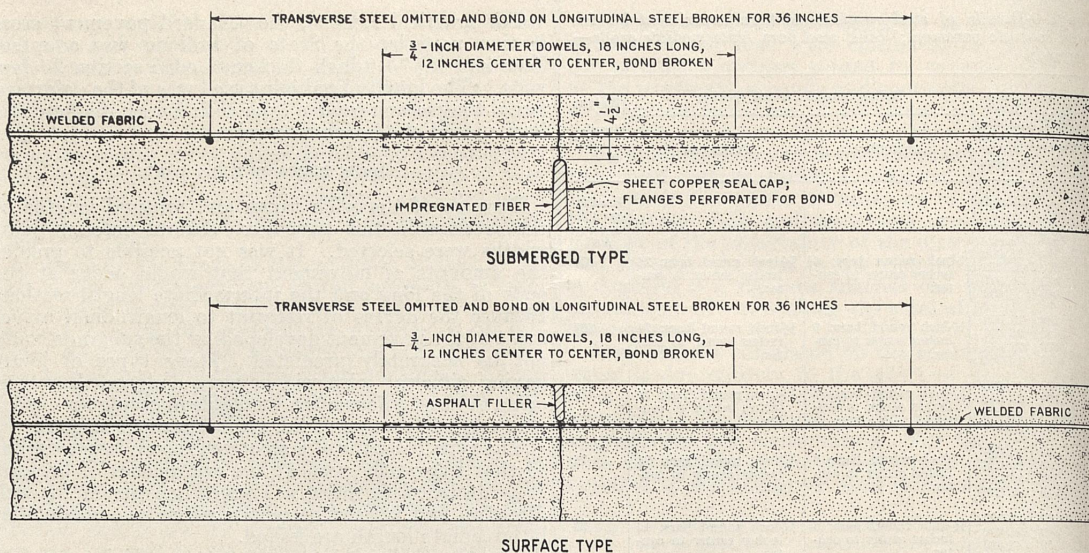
DETAILS OF WEAKENED-PLANE JOINTS. DOWELS OMITTED IN JOINTS IN ONE-HALF THE LENGTH OF EACH SECTION.
